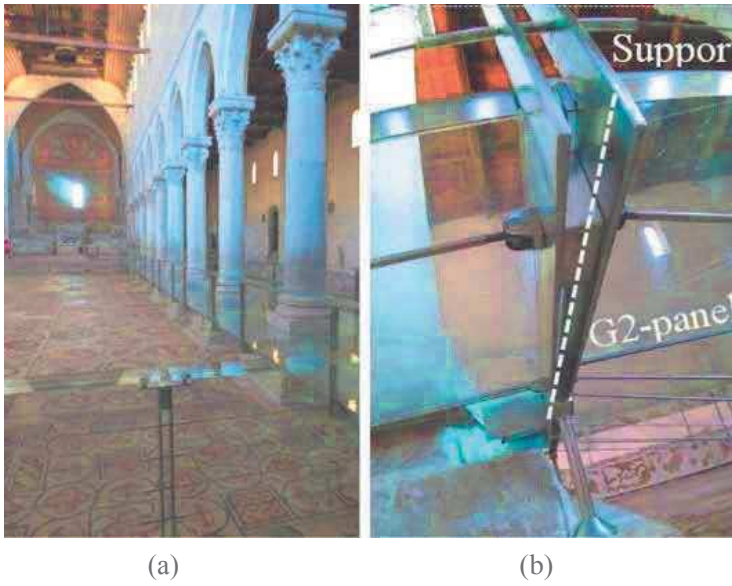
The case-study glass suspension footbridge: (a) general view and (b) detail
